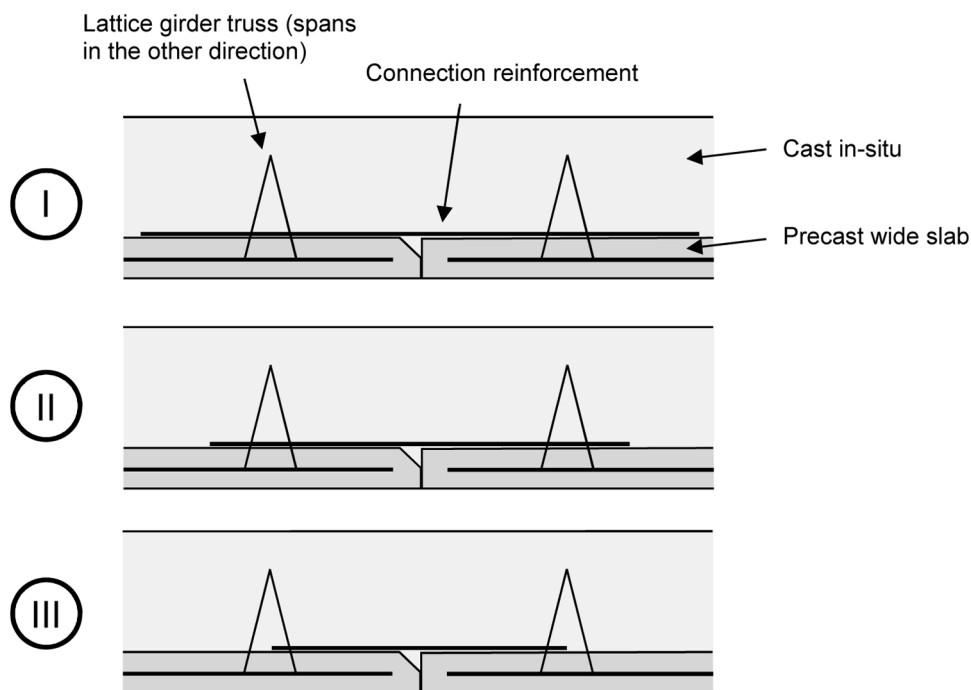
Detailing methods of the joint, viewing the cross-section perpendicular to the direction of the main span (not to scale).
